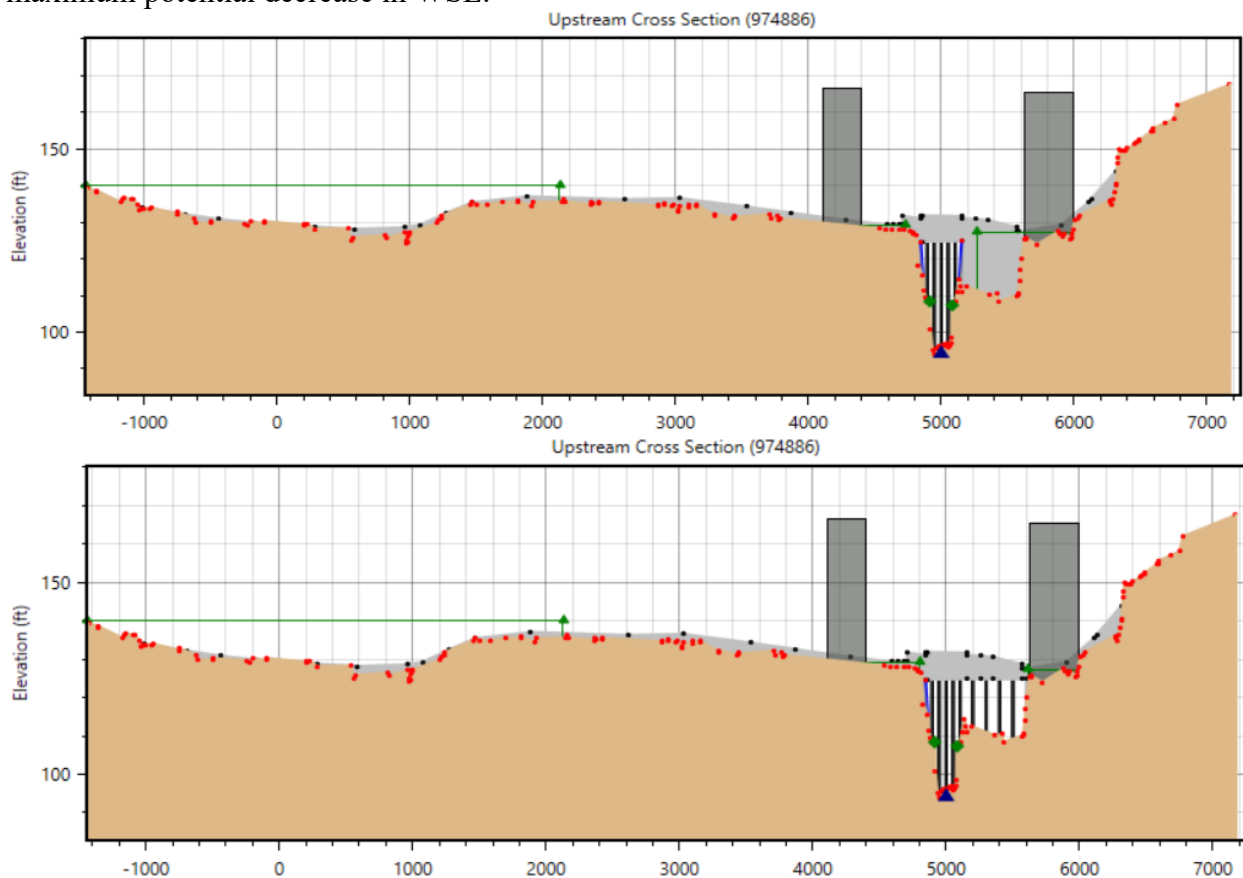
Existing (top) and modified (bottom) cross section for US 301 Bridge crossing (looking downstream). The modified cross section shows the embankment removed, extension of the bridge deck, and additional piers.
